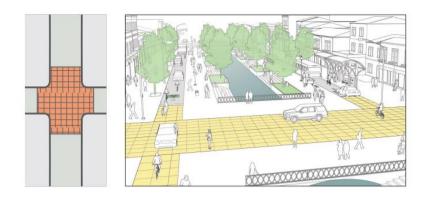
Pavement materials (Bloomberg & Sadik-Khan, 2016)
